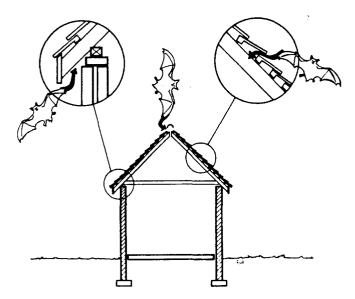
Bats enter under eaves, at badly fitting ridge, and under shingles, slates, tiles.
